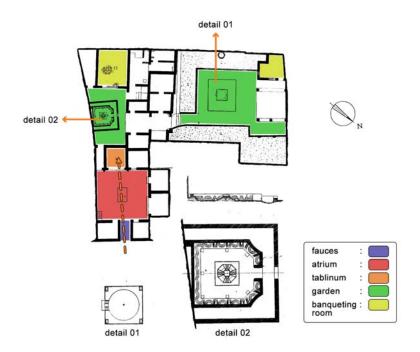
The Plan of the House of Apollo, VI, vii (adopted from Zanker, 1998, 157)
